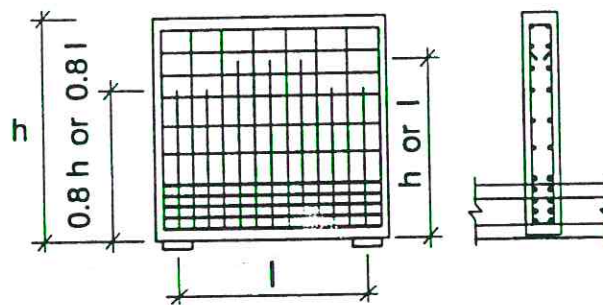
Recommended reinforcement layout for a deep beam with suspended loading (schematic)
